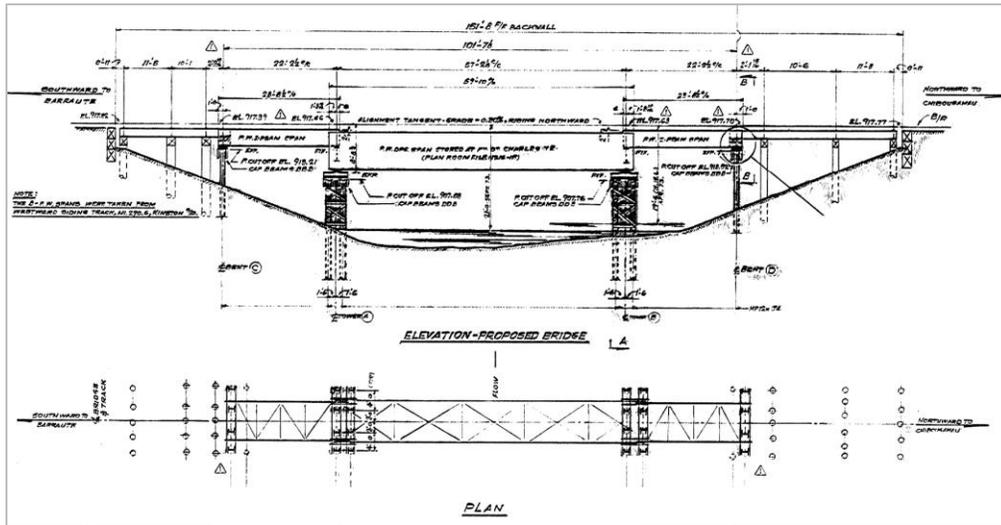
Plan and elevation views of the PK 101.8 Chapais bridge
